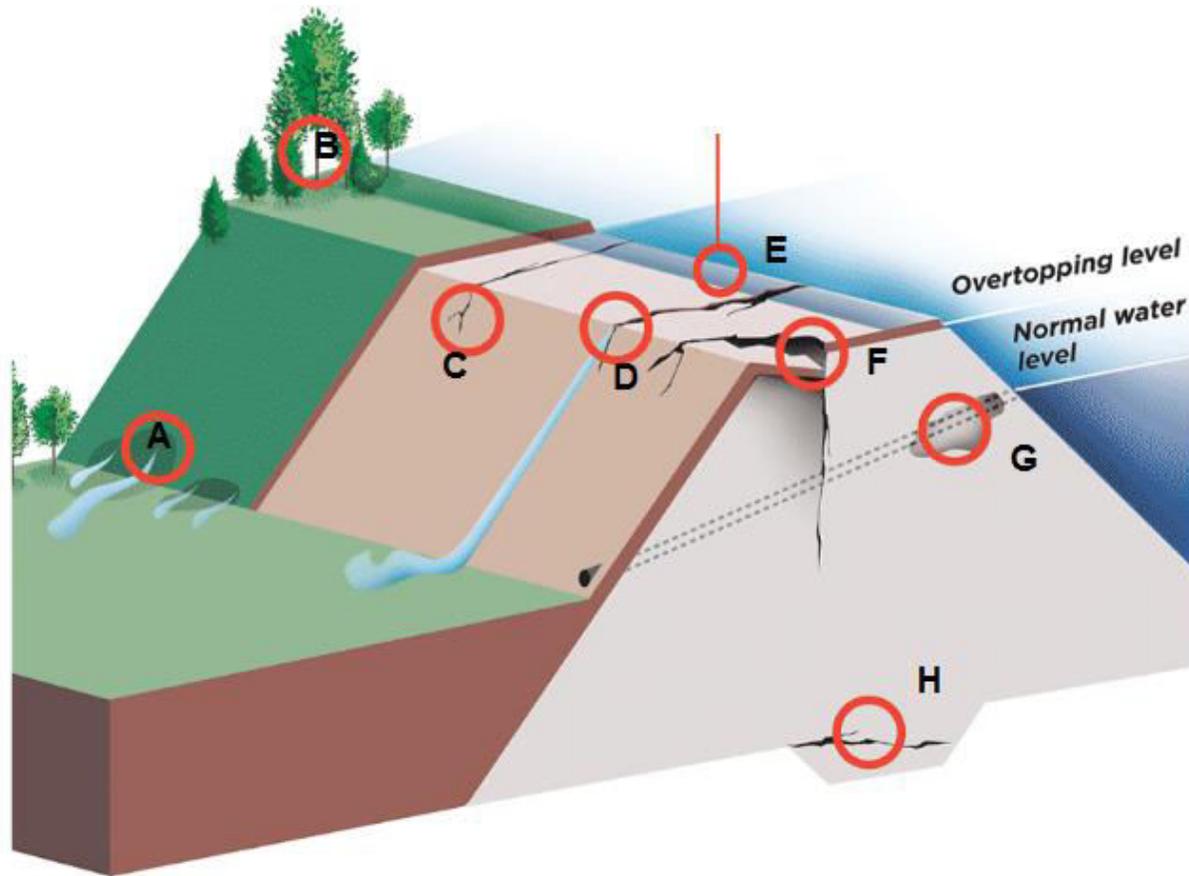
Figure showing typical embankment failures.(Getschow, 2015)
